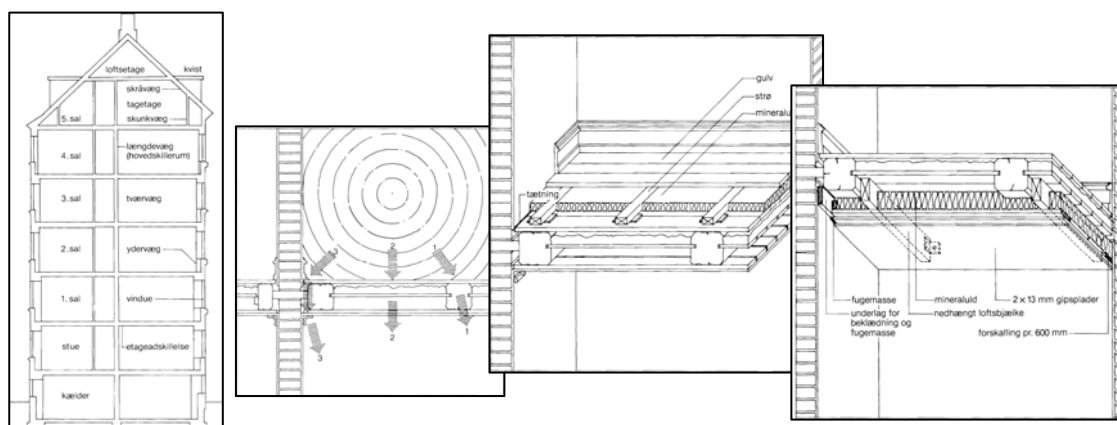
Examples on instructions for improvement of sound insulation of old housing.
